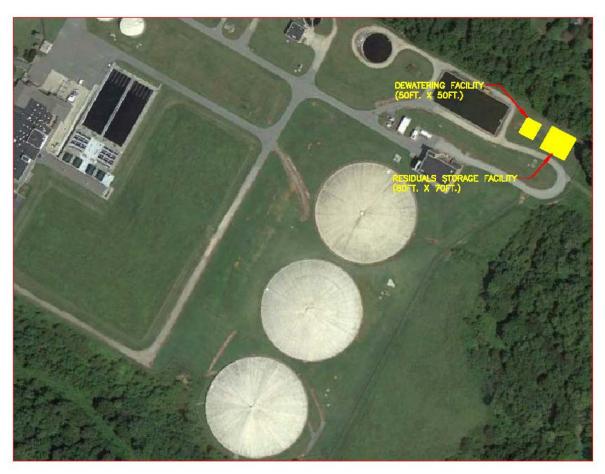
Lee S. Dukes WTP Proposed Dewatering and Storage Facilities
